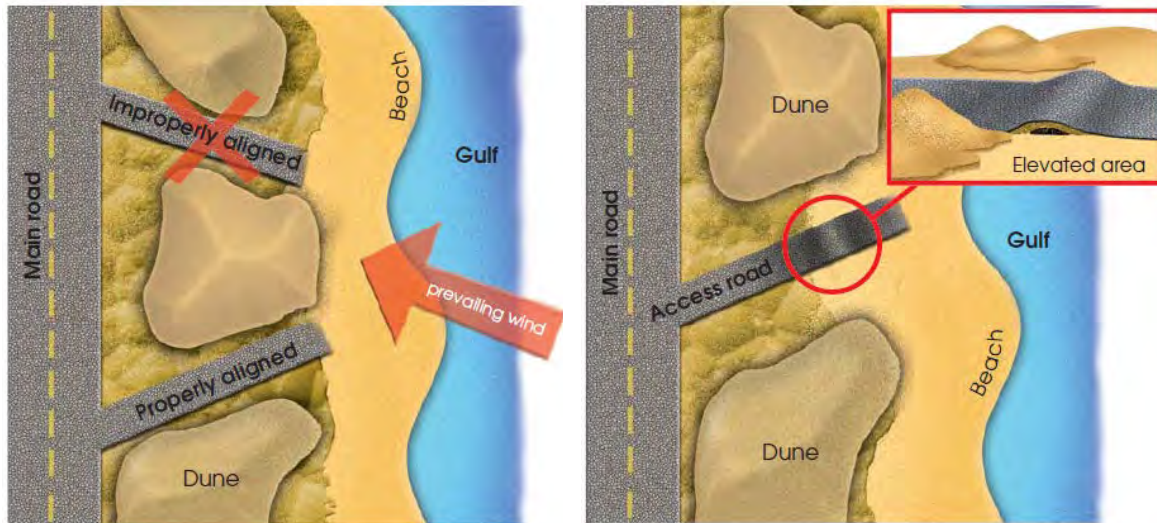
Recommended alignment and elevation of beach access roads. (GLO Dune Manual)
